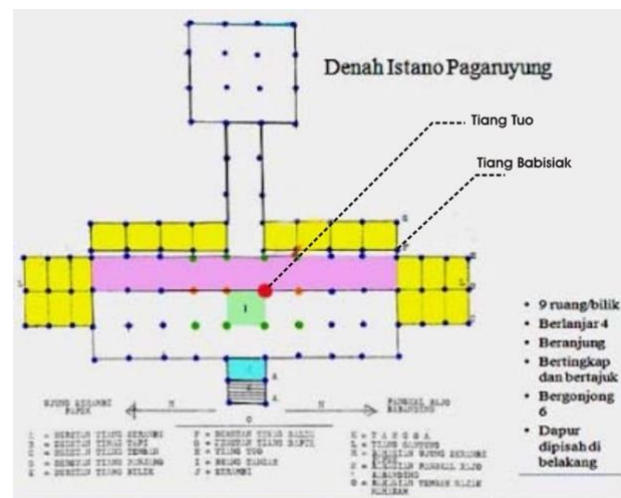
The floor plan of Rumah Gadang (Minangkabau traditional house)
